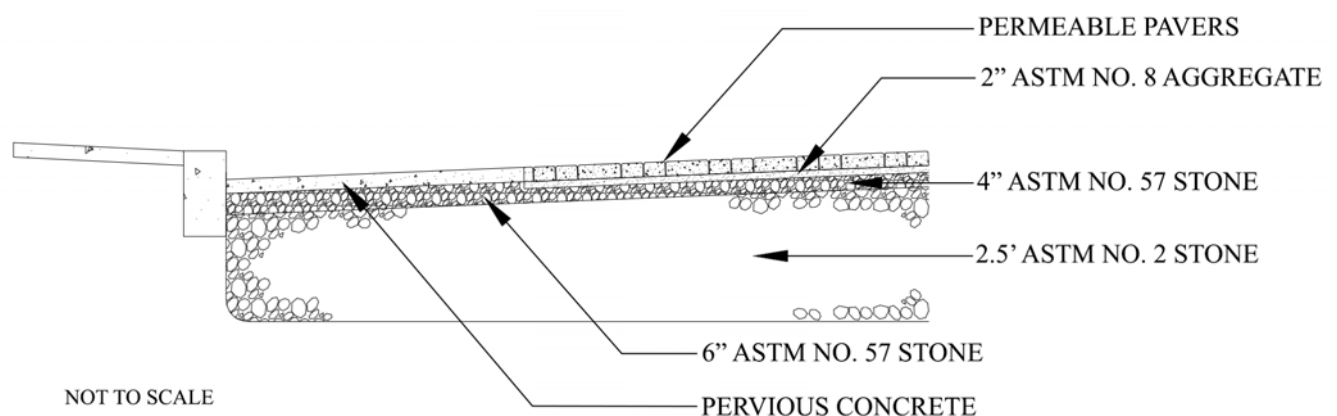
Typical Retrofitted Street Section Detail, *image by Author.
